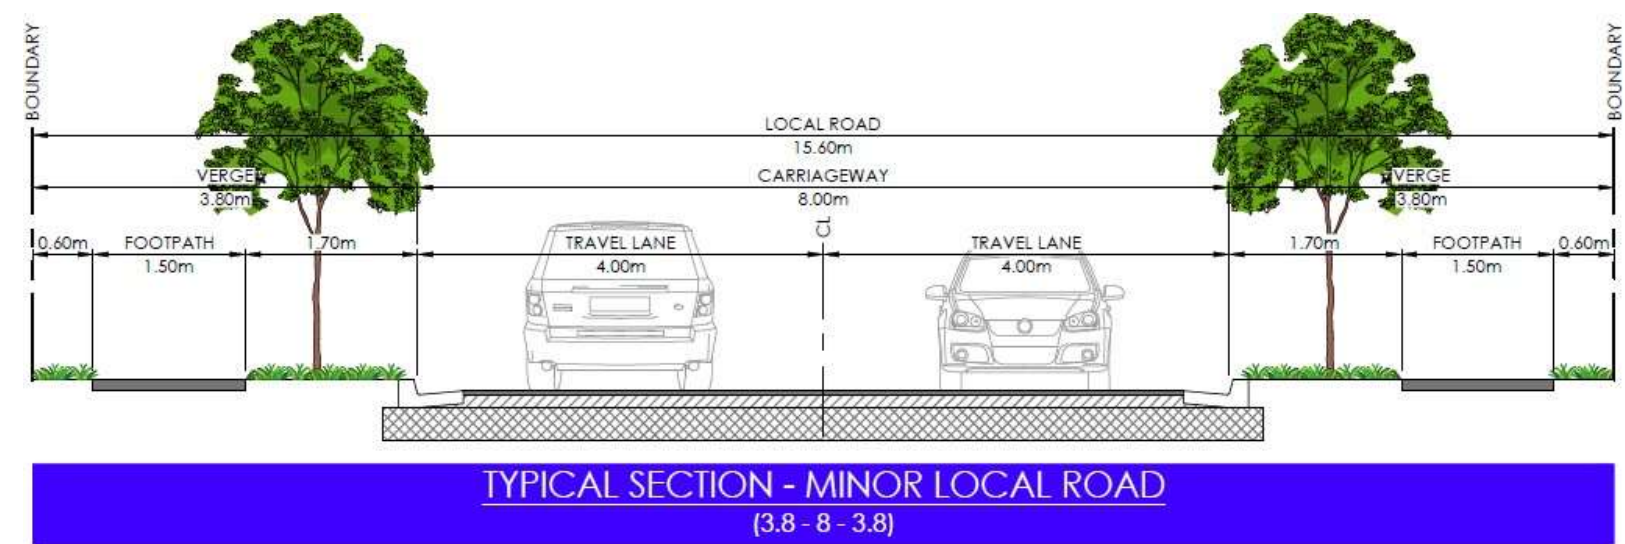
Minor Local Perimeter Road (Adjacent to Bushfire Hazard) Option A
